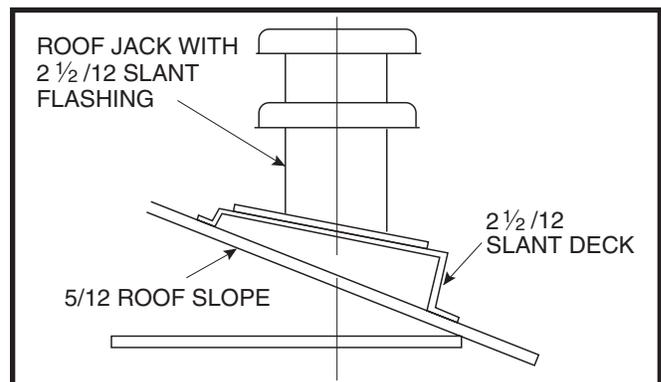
Example of 2 1/2 / 12 Slant Jack with Flashing
